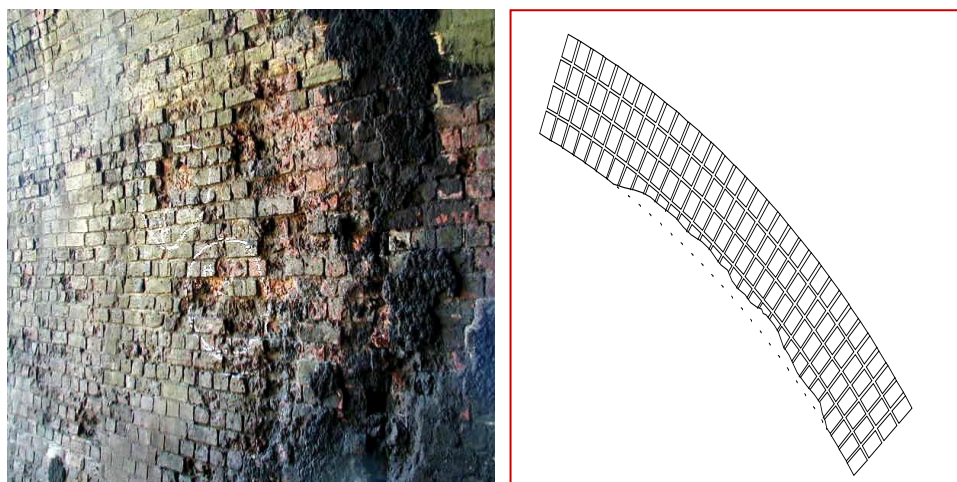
Example of material loss in brick tunnel linings caused by freeze-thaw attack (with permission from Network Rail): photograph of the deteriorated masonry lining and sketch depicting the residual cross- section of the damaged lining.
